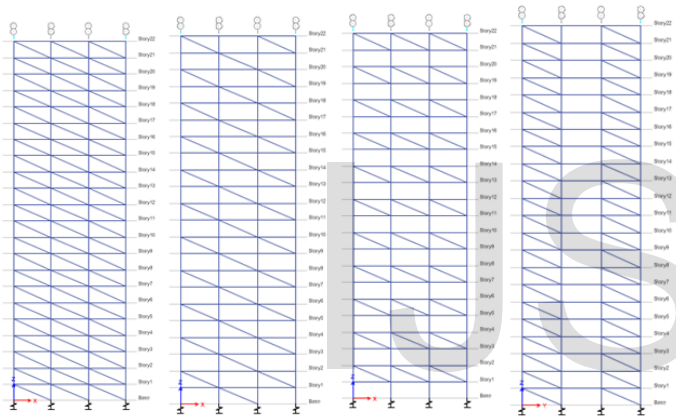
ELEVATION OF 22 STOREY DIAGRID BUILDINGS WITH ECCEN BACKWARD BRACING PATTERN ARRANGEMENT ((A) WHOLE, (B) ALTERNATE, (C) HORIZONTAL, (D) VERTI-CAL)
